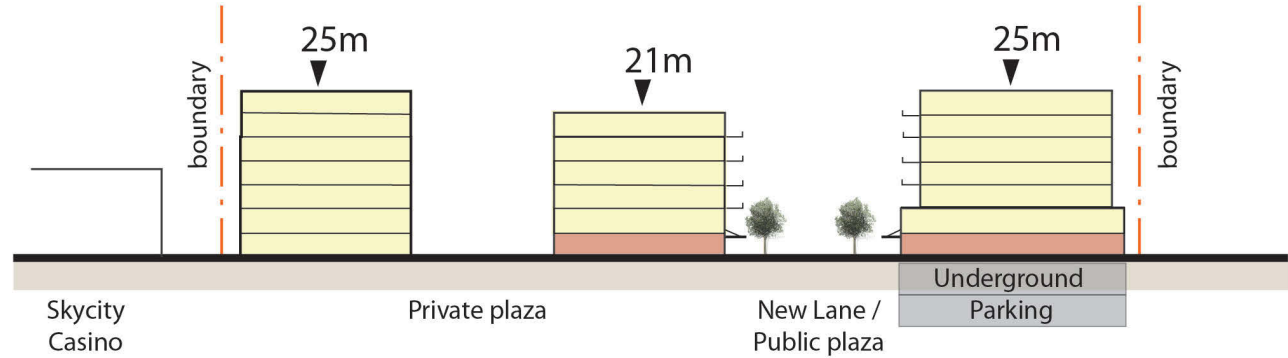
Indicative concept section B-B for Development Site 3 (not to scale)
